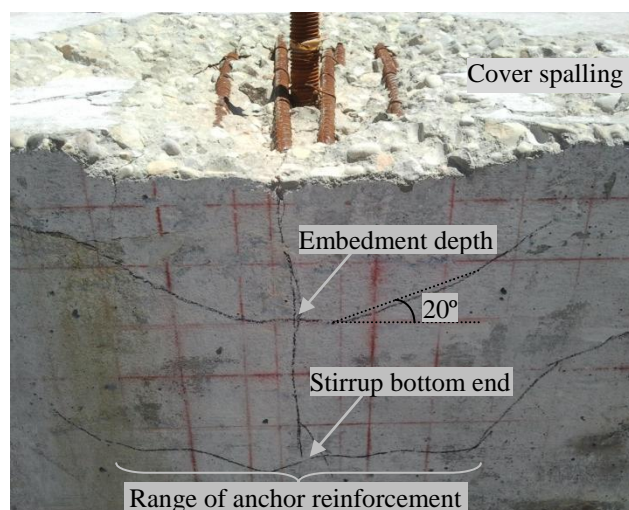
Crack patterns of specimens with Type C reinforcement
